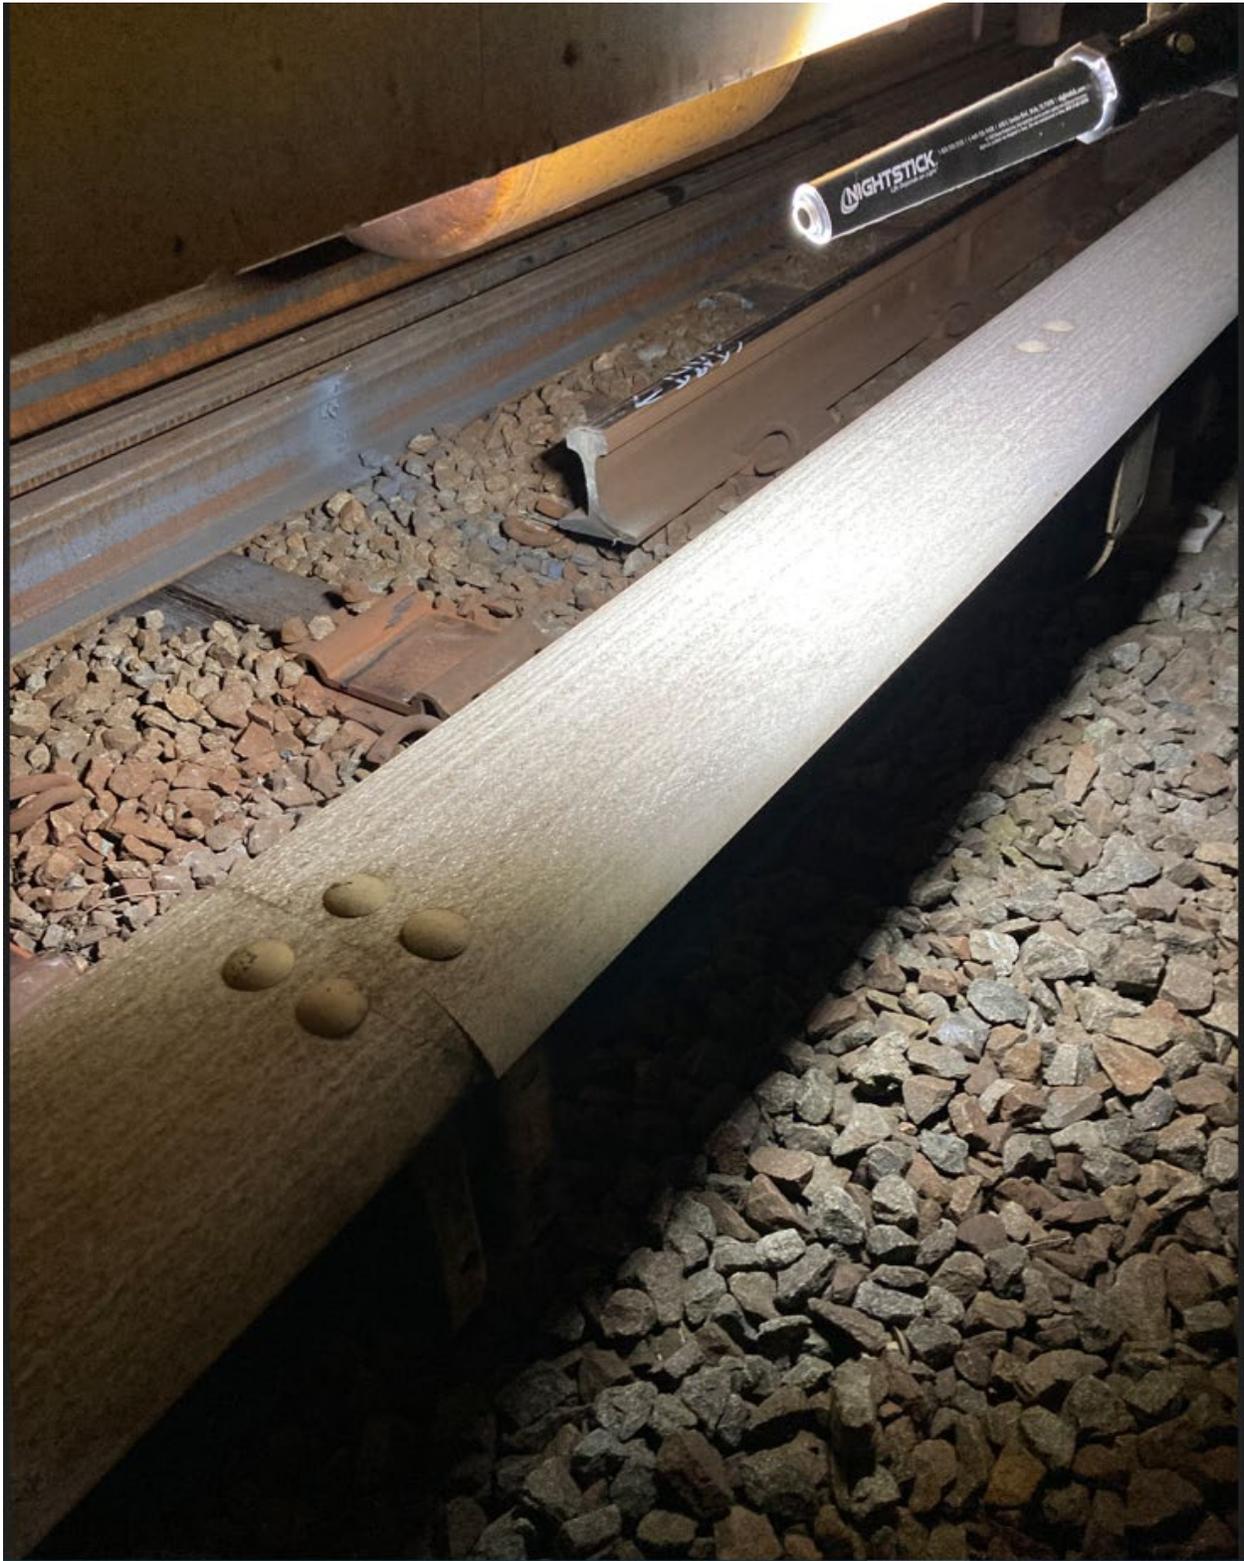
Flat Car 538 front right wheel, derailed to the gauge side (Derailment)
